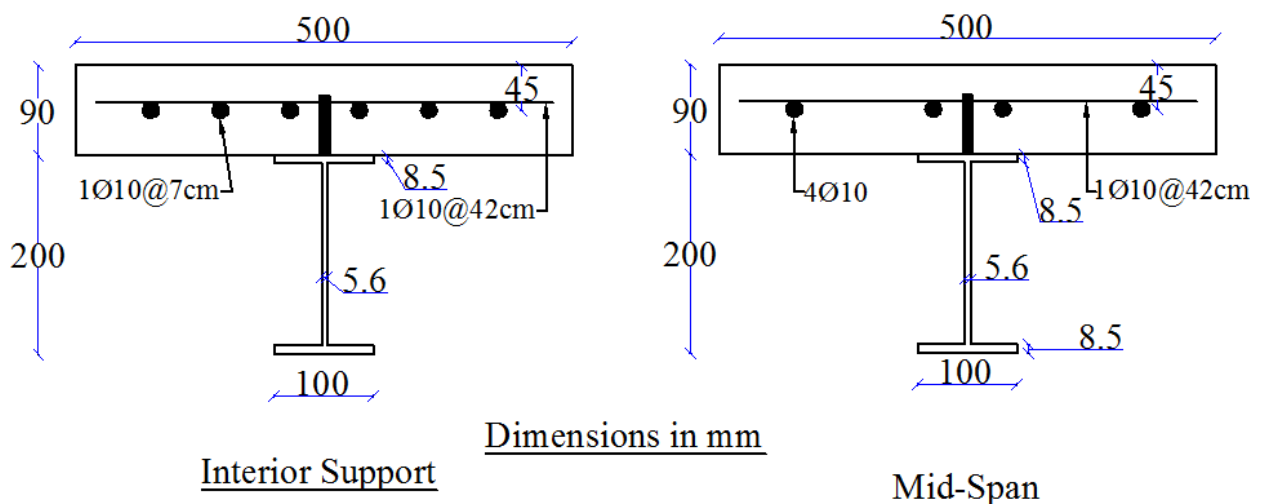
Girder's Cross Sections at both Mid-span and Interior Support
